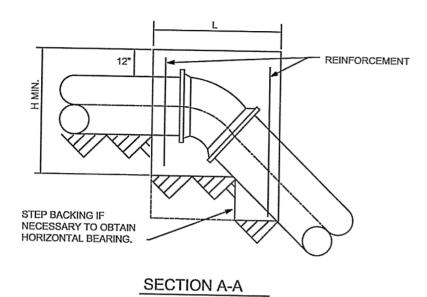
CONCRETE THRUST BLOCK DETAILS FOR RESTRAINED JOINT PIPE
